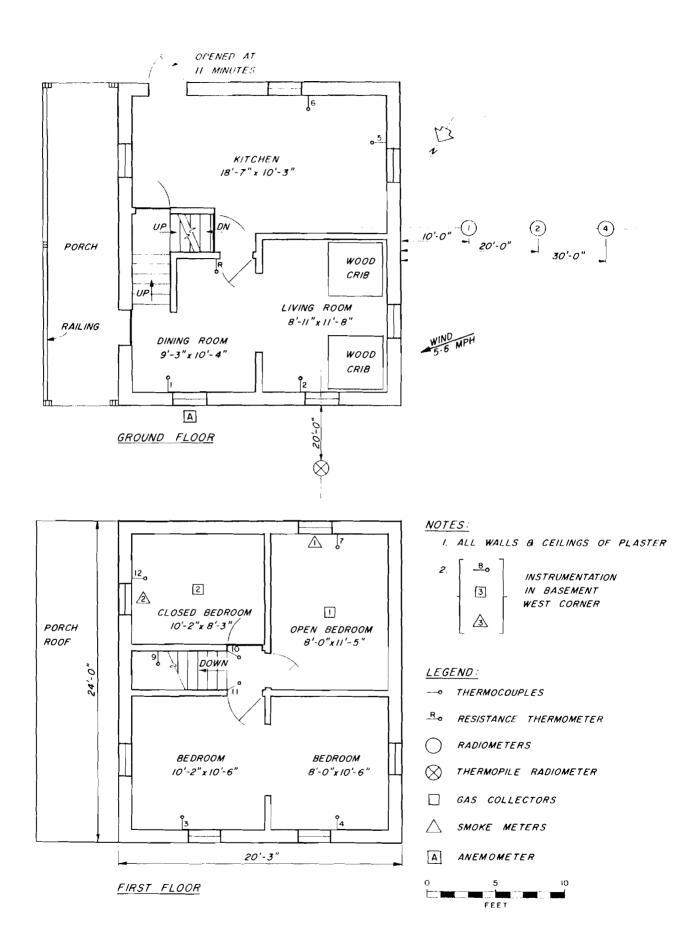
BUILDING No. 1 - TWO-STOREY SOLID BRICK DWELLING
